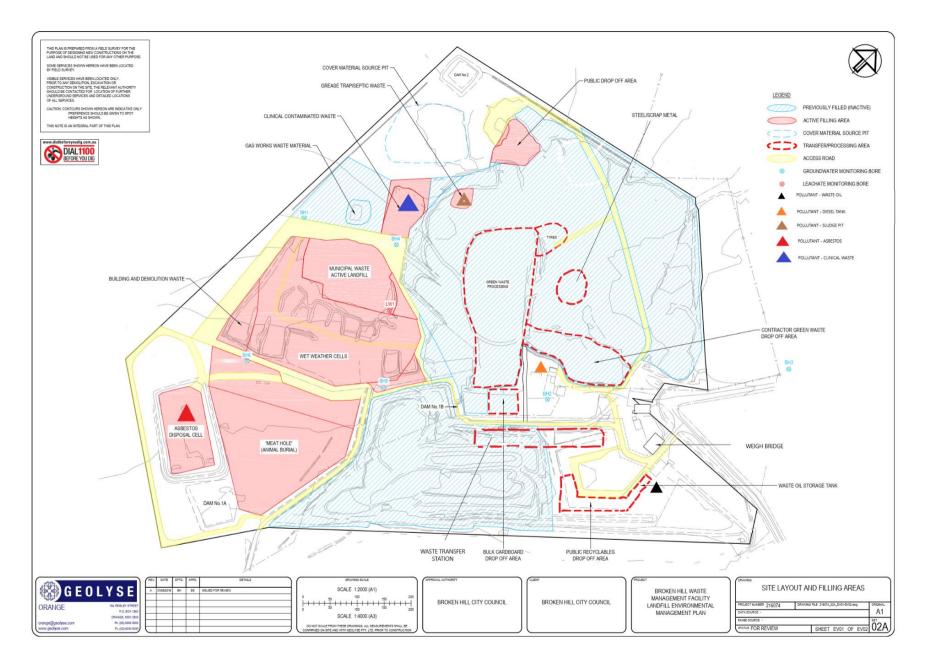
Broken Hill Waste Management Facility Layout Plan showing pollutant locations
